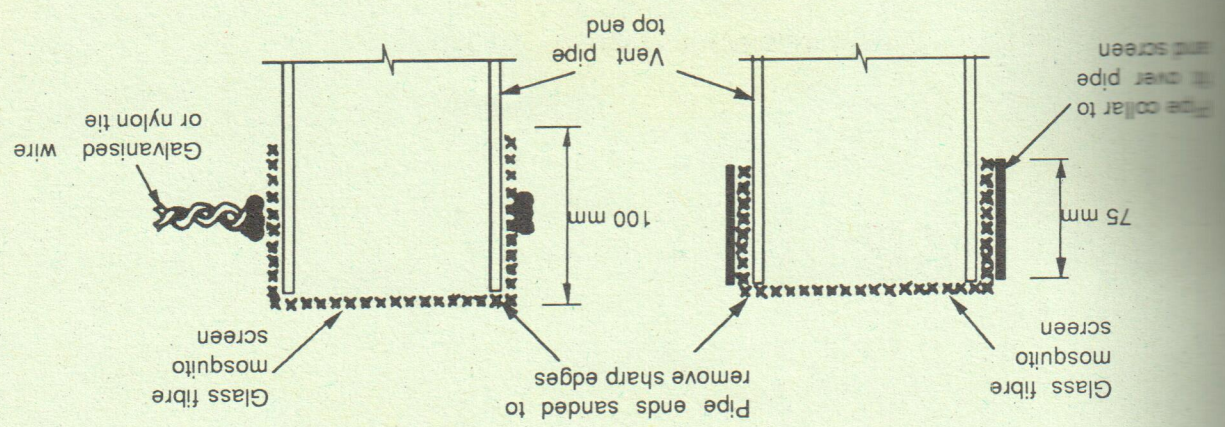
B FIXING OF INSECT SCREEN OVER VENT PIPE
